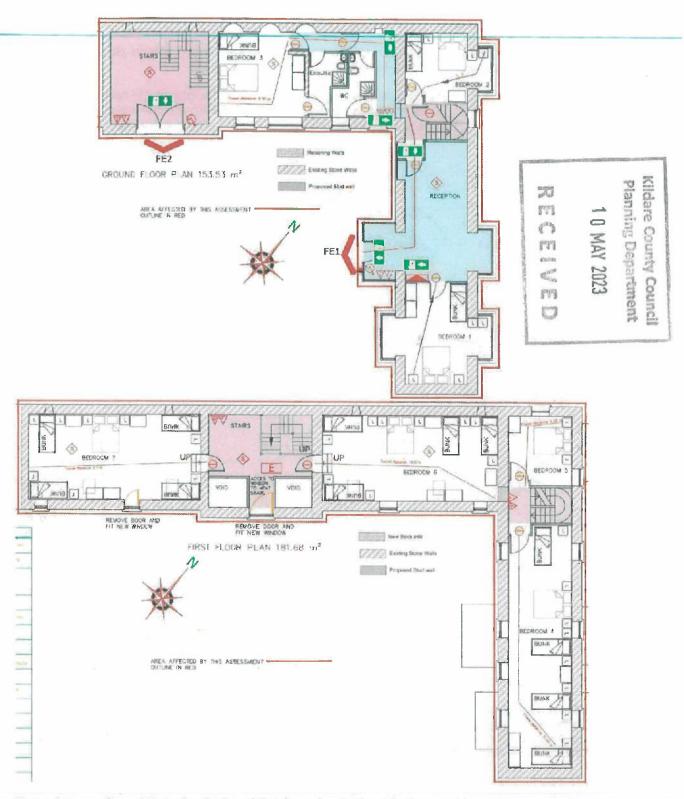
Ground floor plan (top) and first floor plan (bottom) for the coachhouse.
